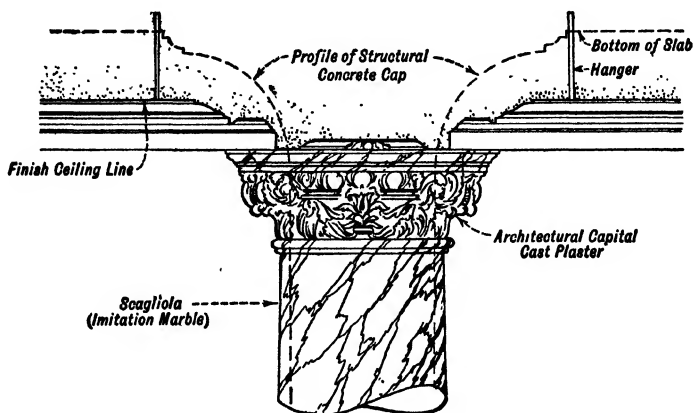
Detail of Suspended Ceiling and Architectural Column Cap. Interior of Salada Tea Building. (See p. 760.)
